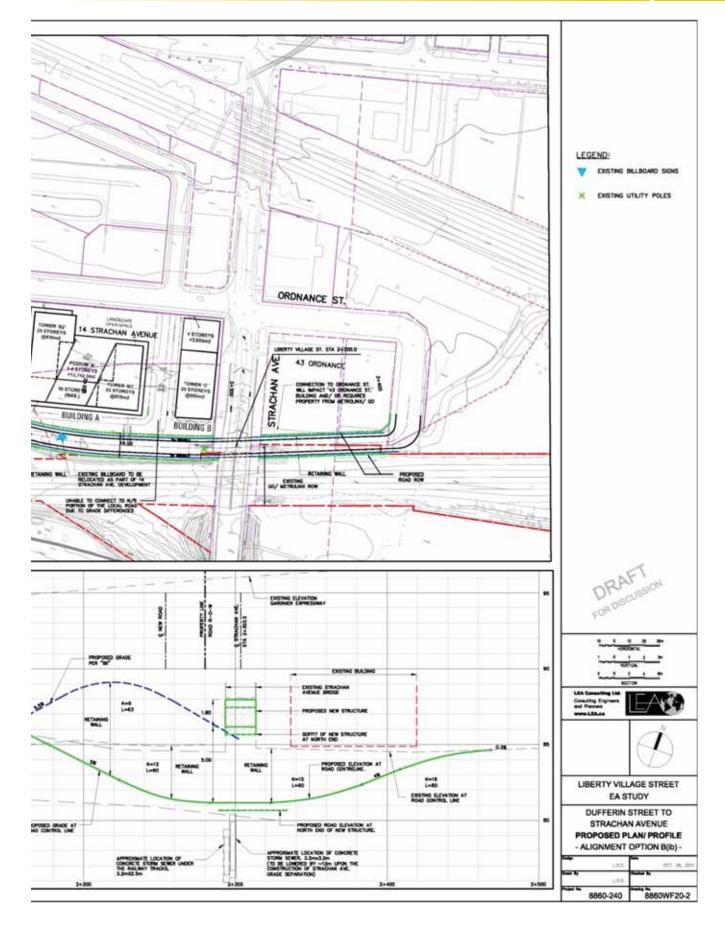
Sub-Option (b) - Potential East-West At Underpass Roadway Connection at Strachan Avenue
